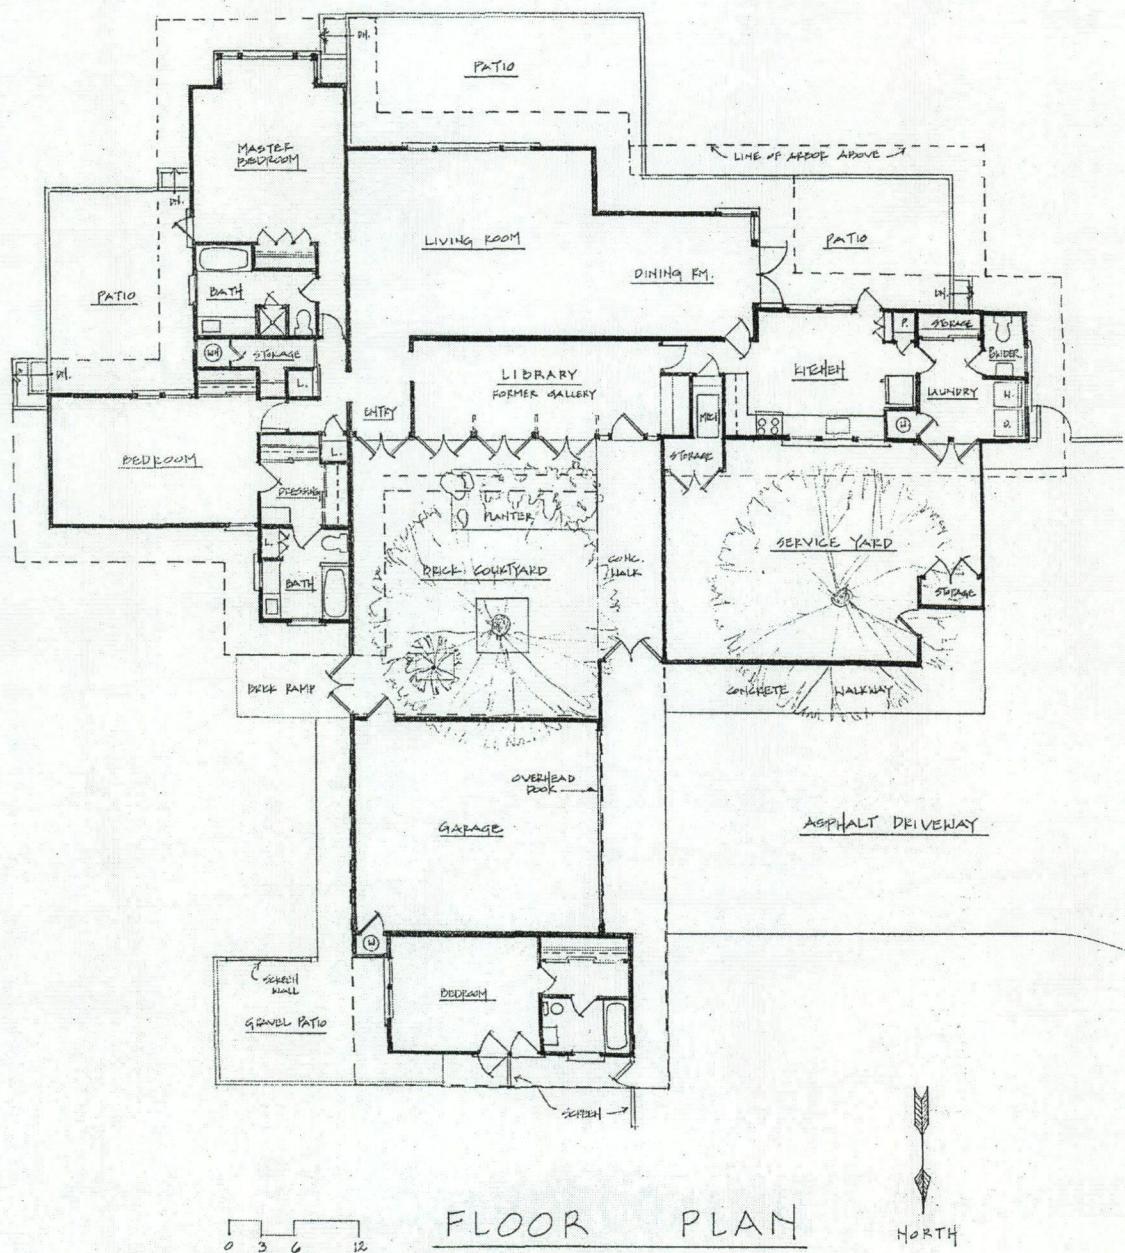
Existing Floor Plan drawn by Elizabeth Churchill based upon original design drawings in the Alexander Archive at the University of Texas at Austin and field measurements.
